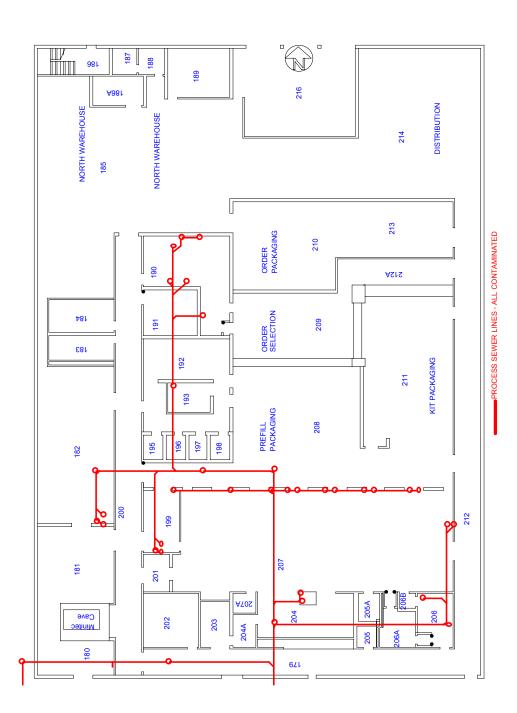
Building 124 North End Process Drain Area (In Color)
